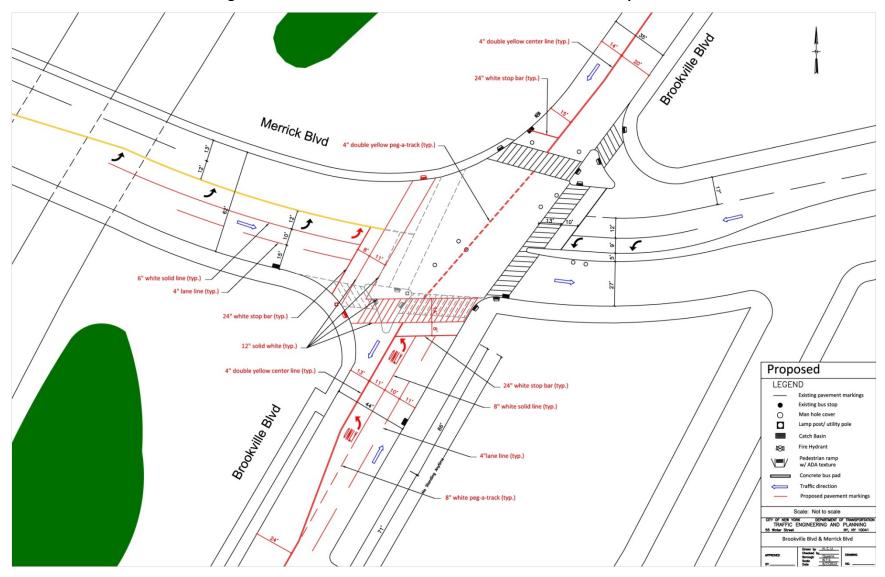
Merrick Boulevard and Brookville Boulevard - Proposed
